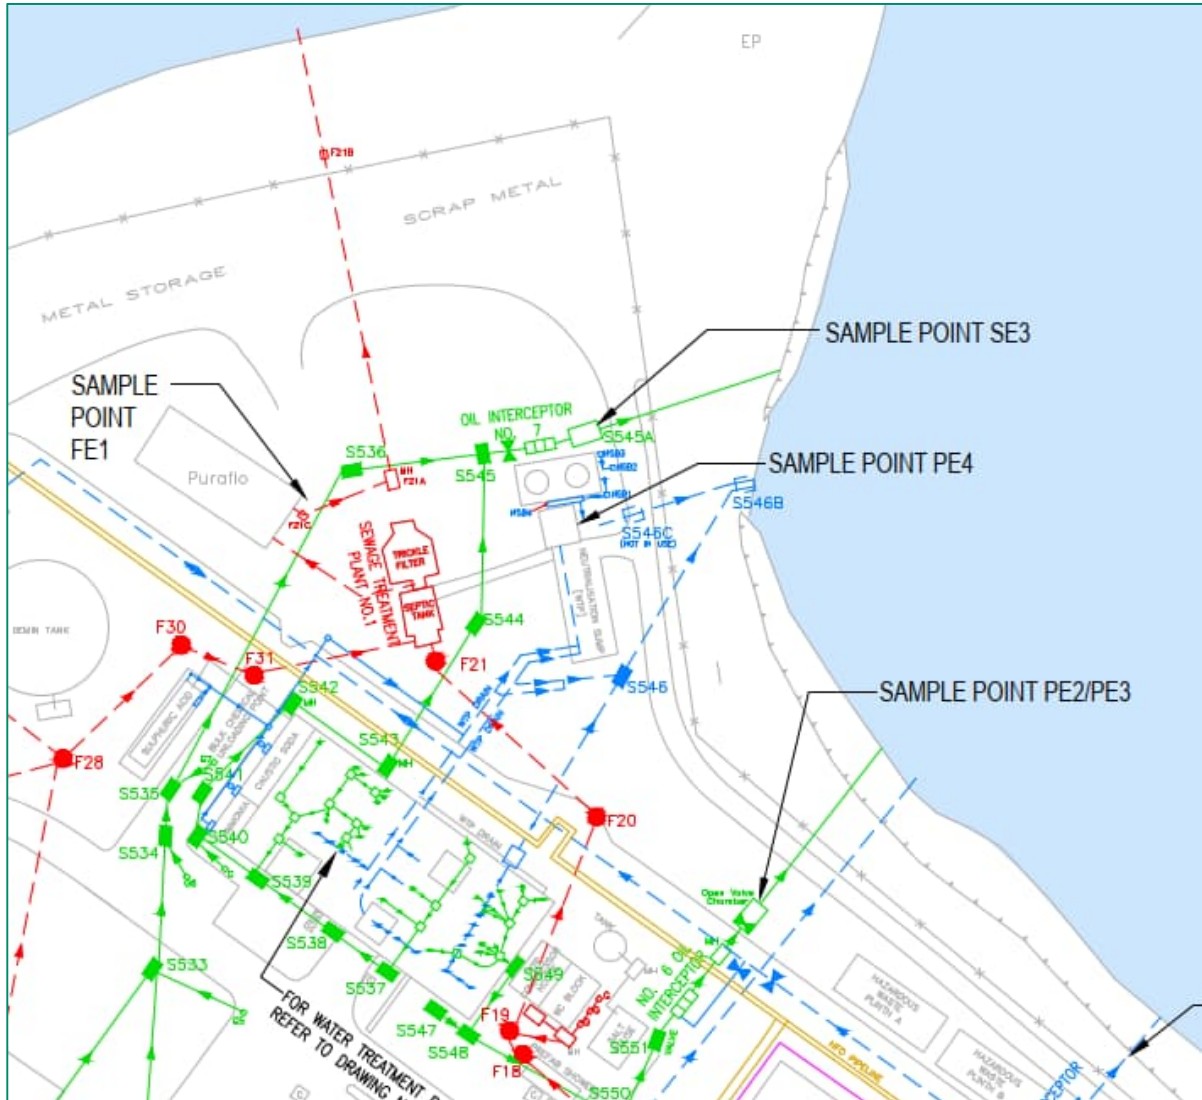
Existing Drainage Outfall Locations (Source: Extract from Site Drainage Layout (SSE DRG no. 845_0804_0003 Rev. 02))
